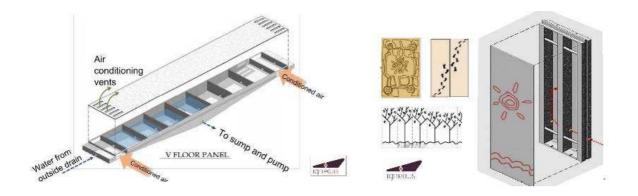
Floor panels which include the footings and water tank and air conditioning ducting
